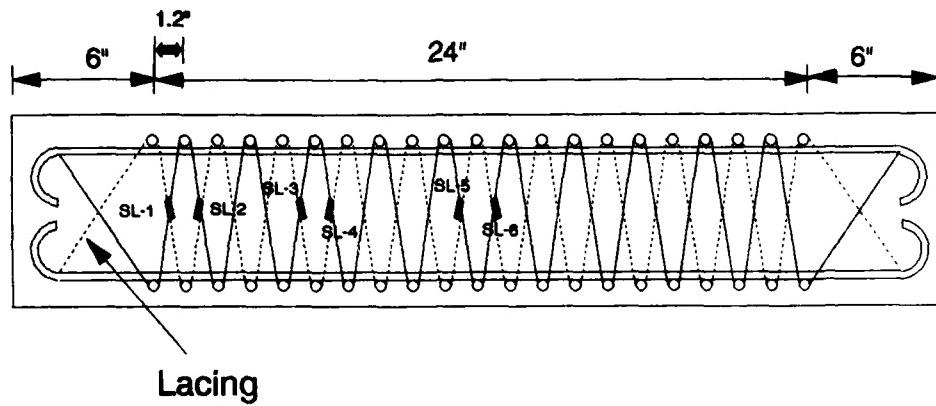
Strain Gage Locations on Lacing in Slab Nos. 8 and 9
